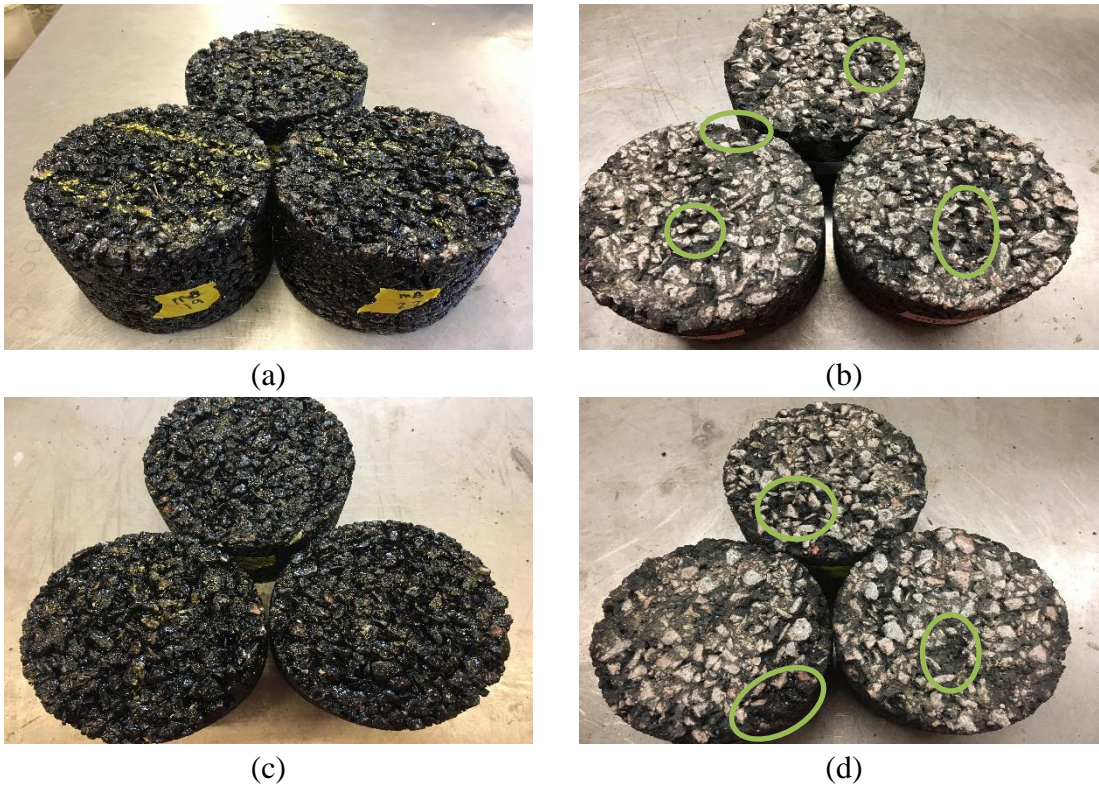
Planetary Motion Surface Abrasion Test on the Top of the Specimen Using Cutter B (a) Un-Aged Before, (b) Un-Aged After, (c) Aged Before, and (d) Aged After
